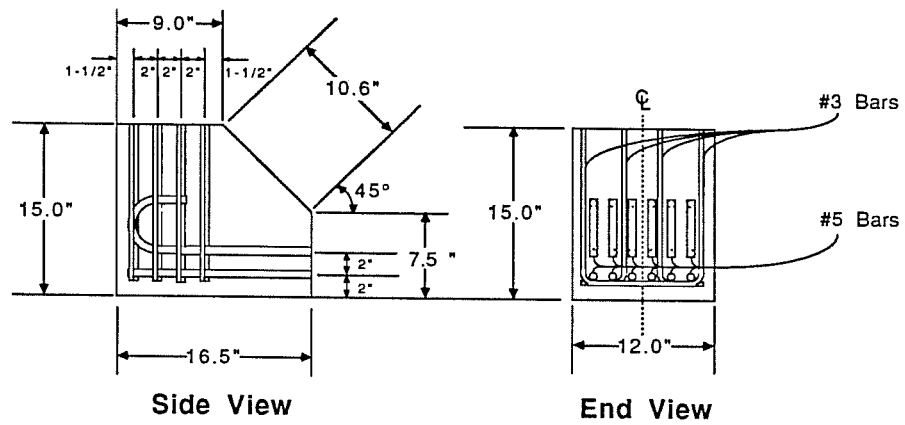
Bearing Surfaces Used for Isolated Tests
